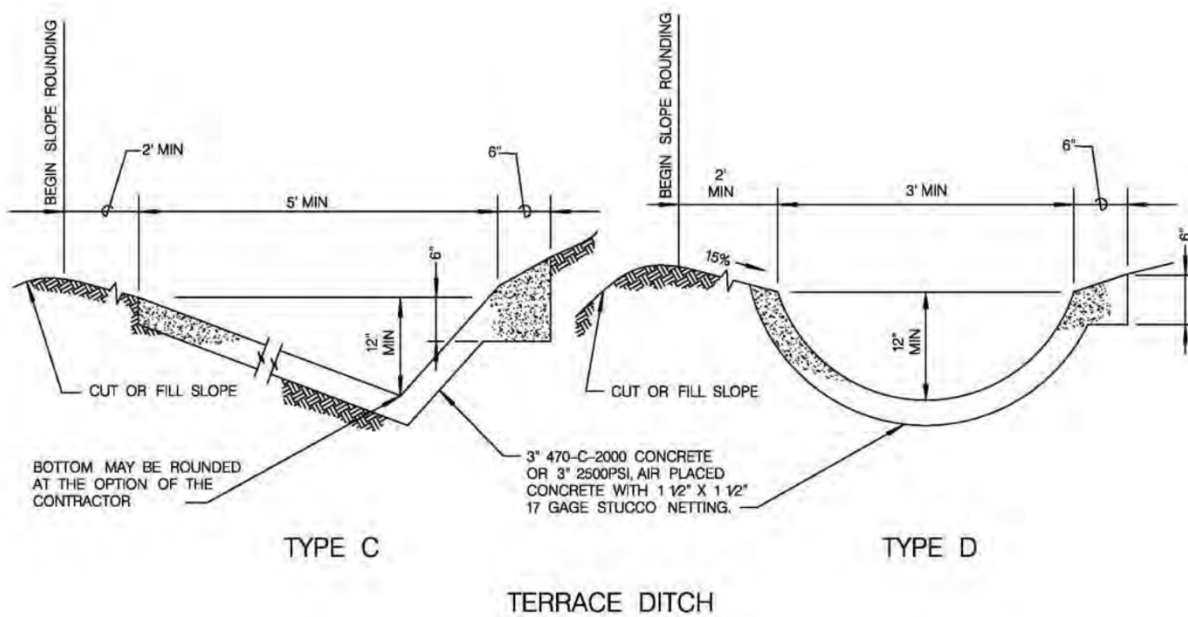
Ways drainage ditches can be installed adjacent to sidewalks (City of San Diego..., 2016).
